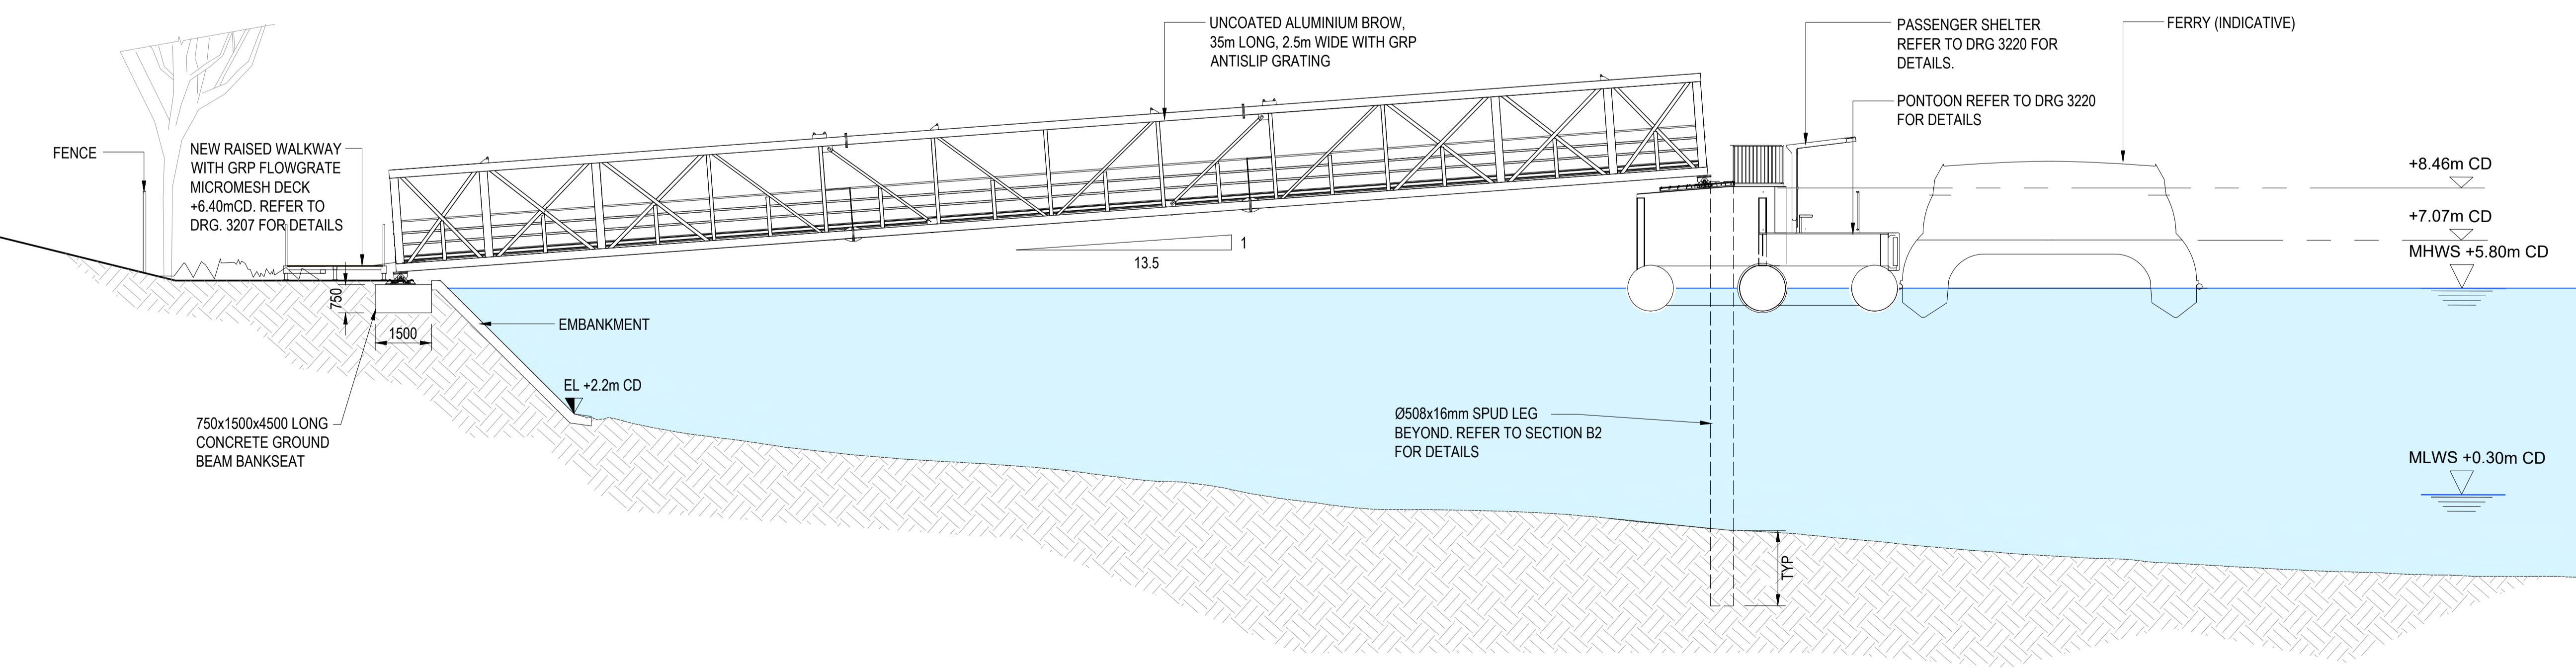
PROPOSED BARNES PIER - RIVER SECTION:
